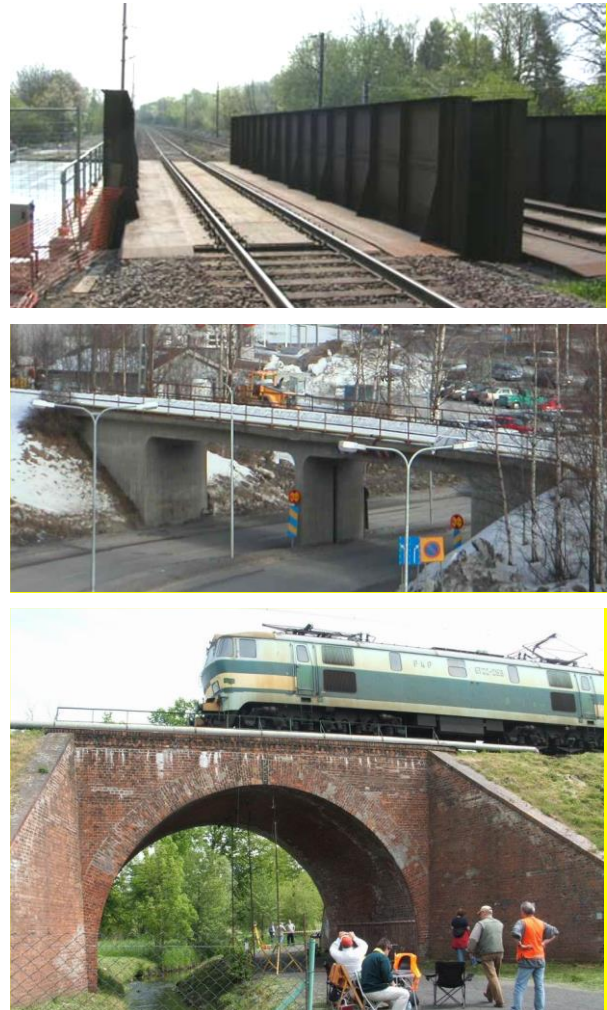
Field tests: Riveted Steel Beam, Reinforced Concrete Frame and Masonry Arch
